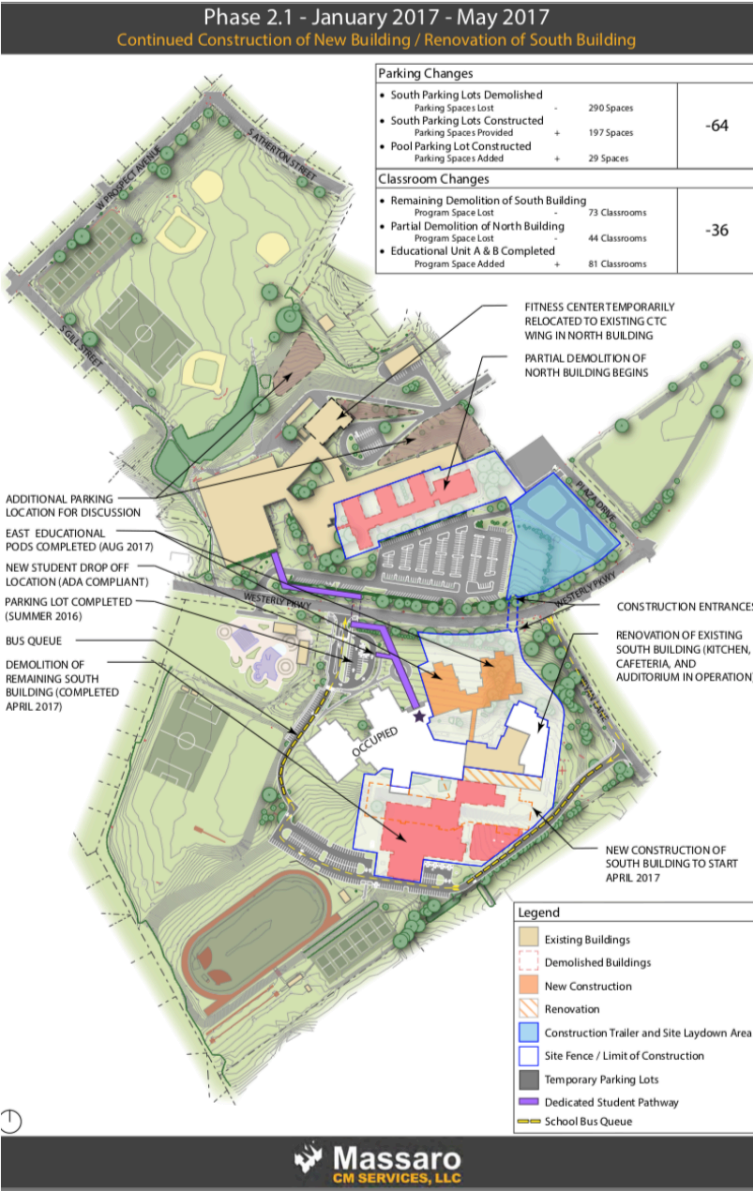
Sample Site Utilization Plan (Source: Massaro Construction)
